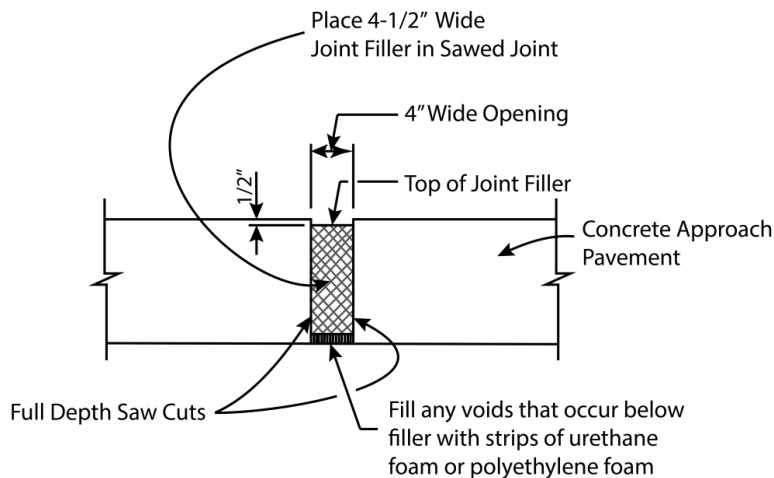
Example Detail of a Closed Cell Joint Seal Pressure Relief Joint
